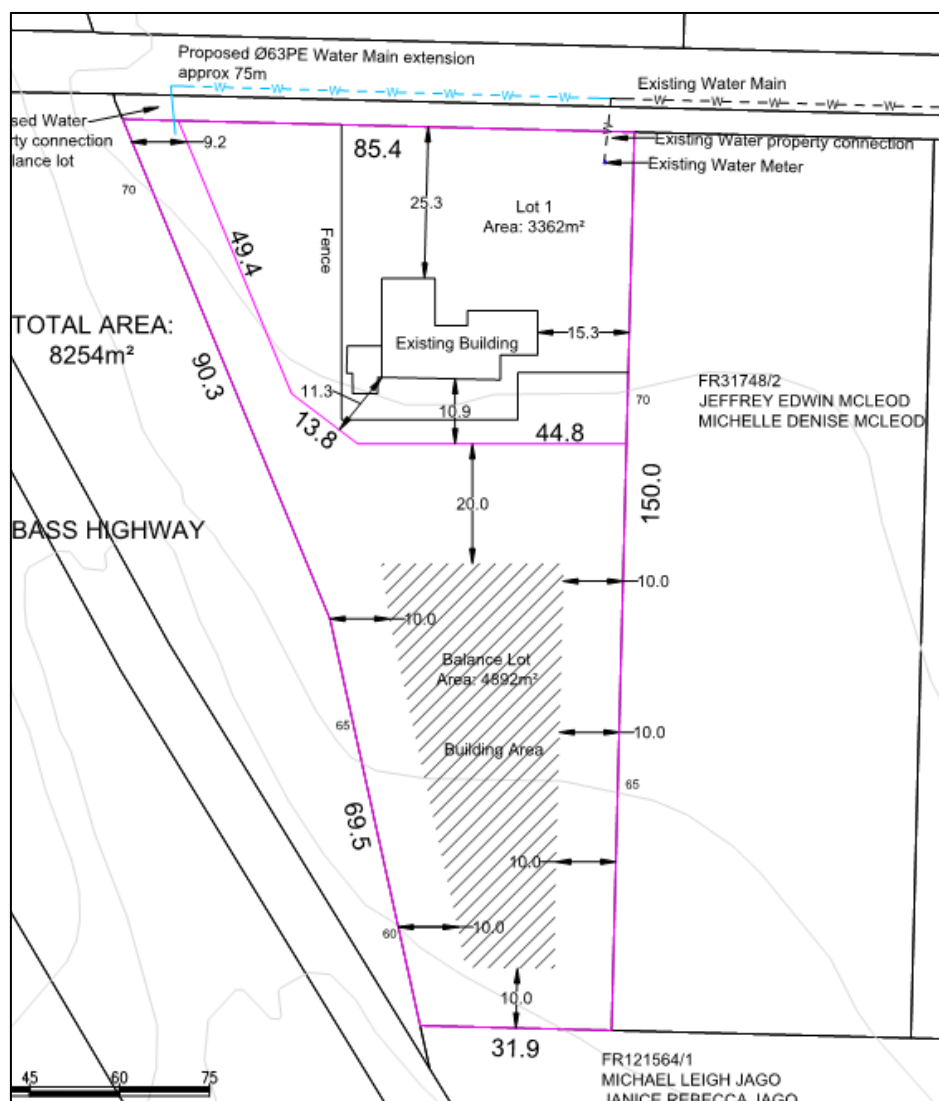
Subdivision plan submitted by applicant (Veris, 2018)
